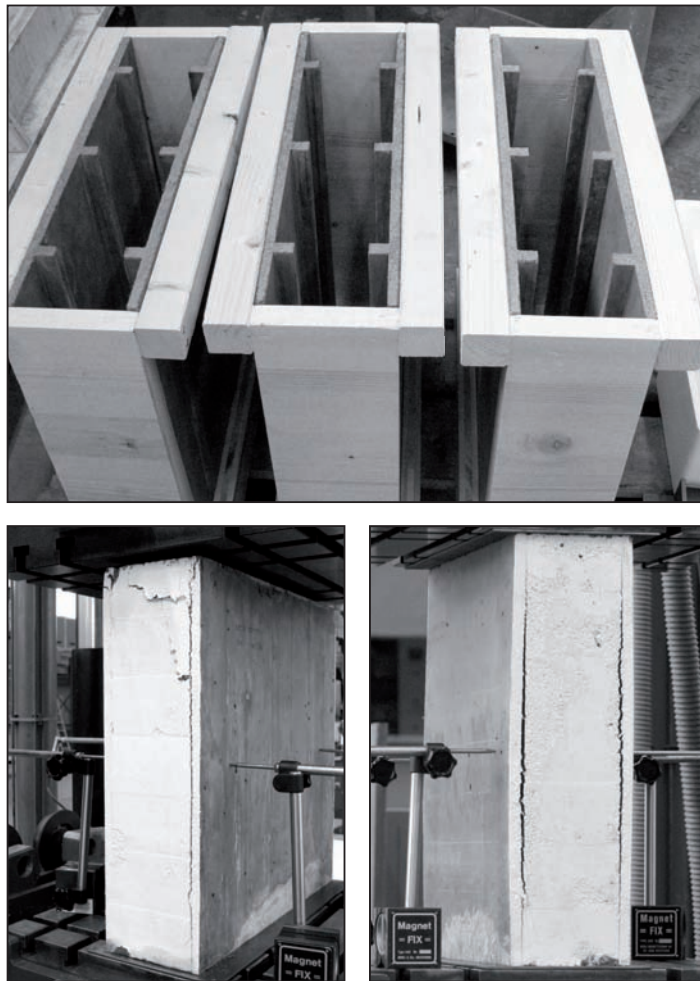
Images of the sandwich elements: HFC walls and two specimens under load
